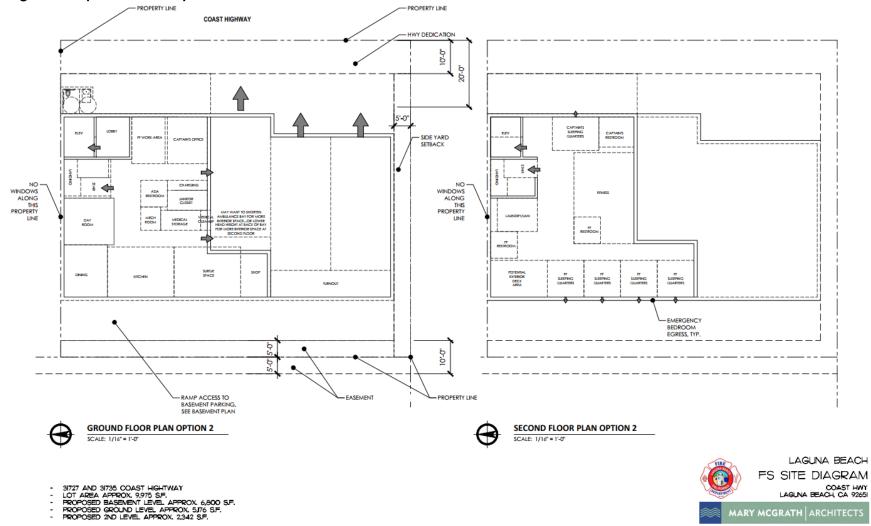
Option 2 Conceptual Ground Floor and Second Floor Plans
